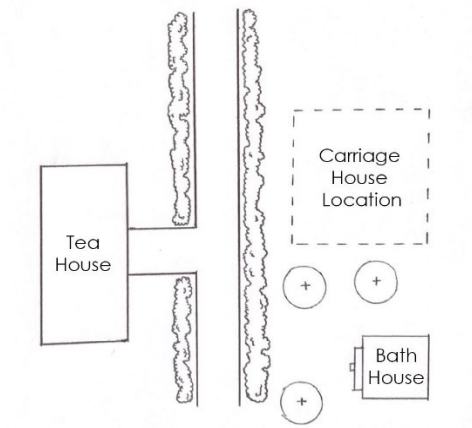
Hand sketch of proposed new Bath House location with Heritage Park
